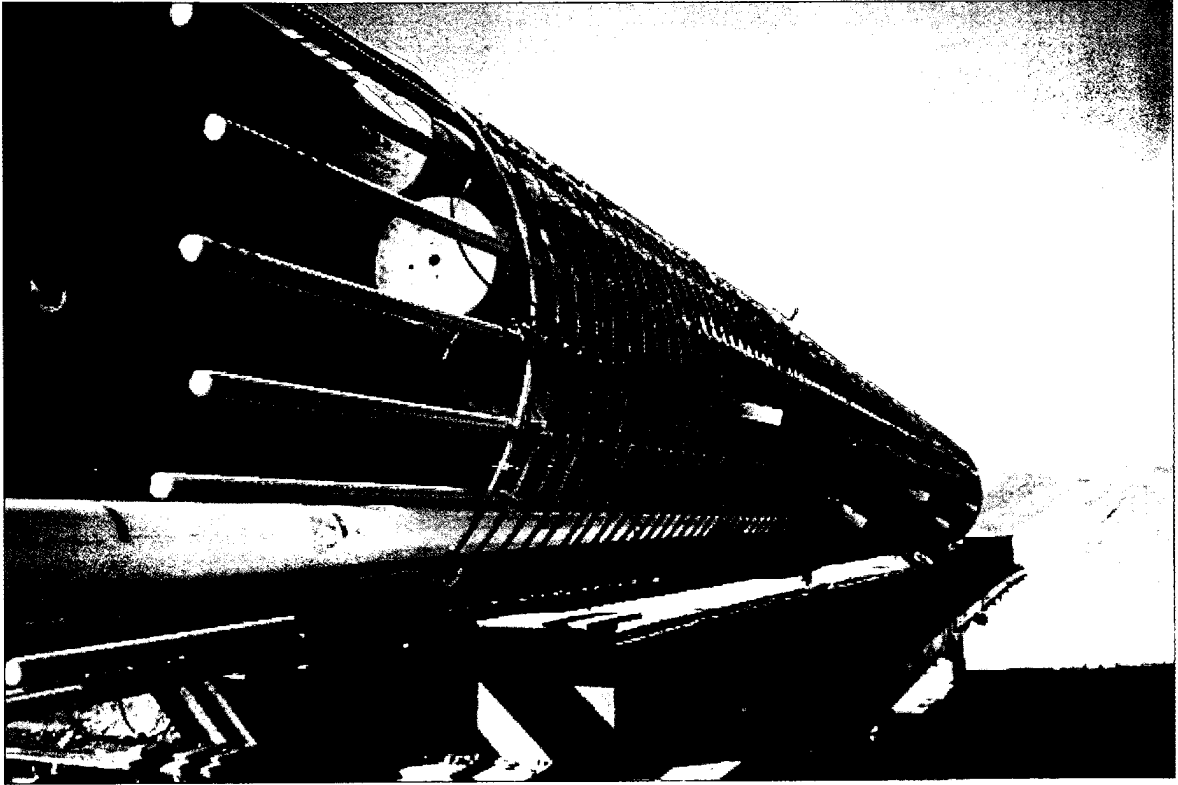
Gages installed and wires run to the top of the section and the PVC housing tube for inclinometer.
